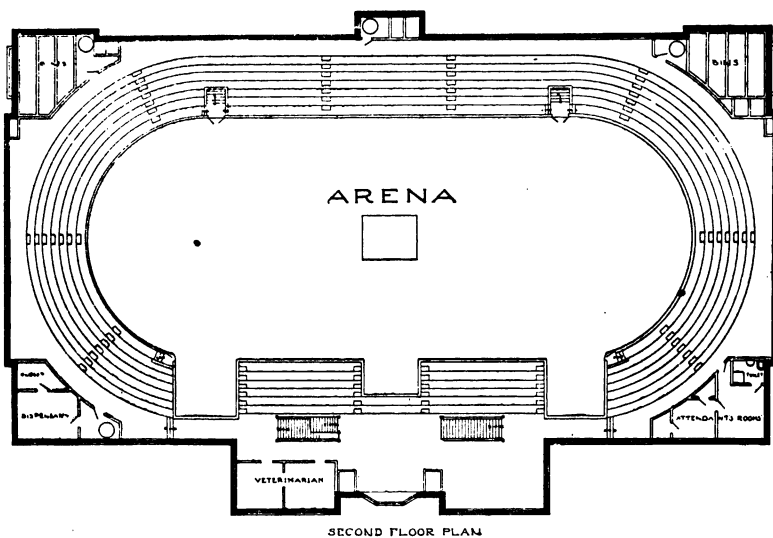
Second floor plan of live stock pavilion, showing arena with concrete ledges for seats and additional offices.
